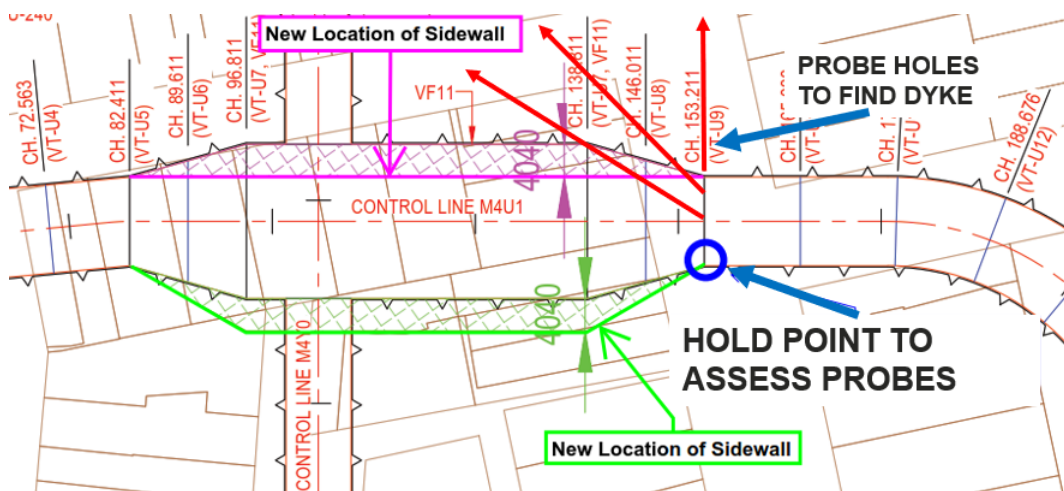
Probing Plan & Option for Alternative Ventilation Cavern Geometry
